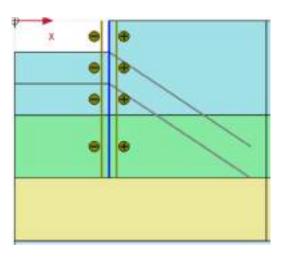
Phase 1, excavation and activation of the diaphragm wall.
